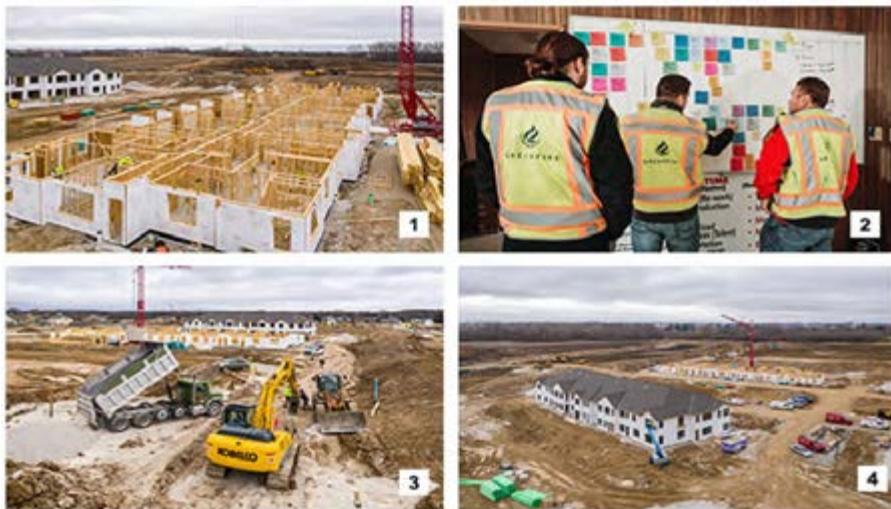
Aerial looking Southeast over building 11, second building on site that is currently in framing (2) Project team during a pull planning meeting adjusting and monitoring timelines (3) Aerial looking Northeast over heavy machinery and view of site (4) Aerial view looking Southwest across watertight building
